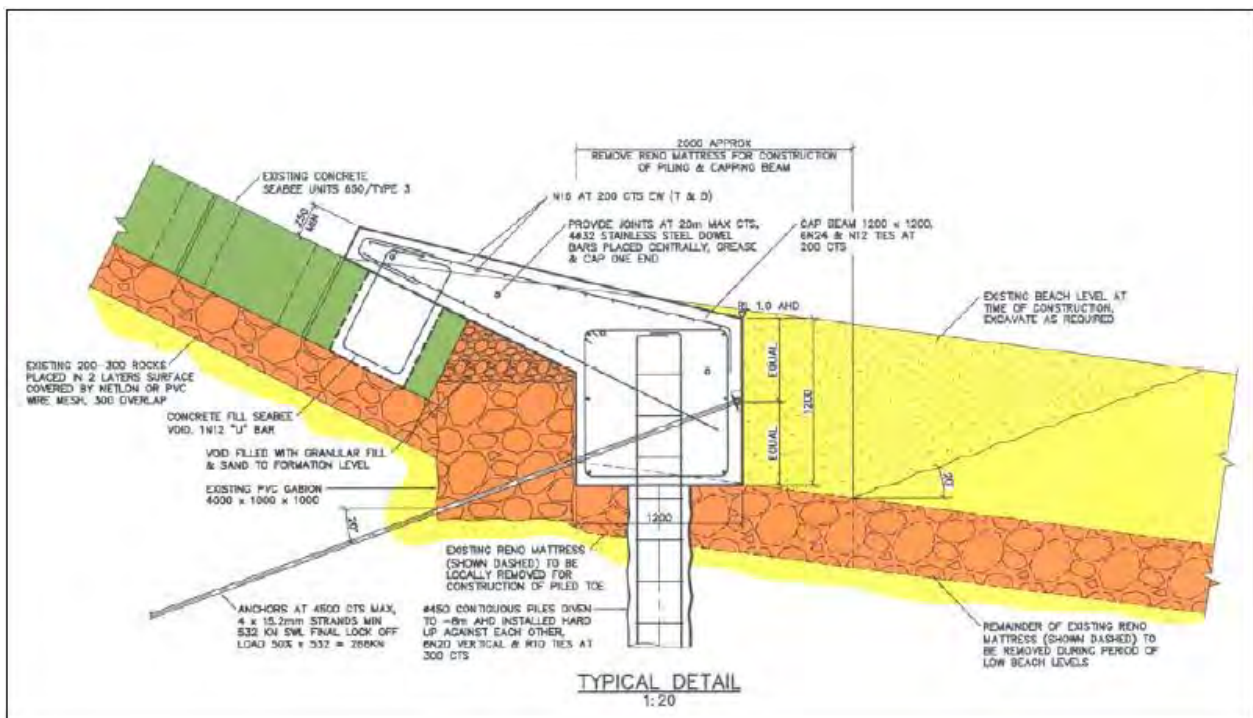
Typical section through stabilisation works to Prince Street Seawall
